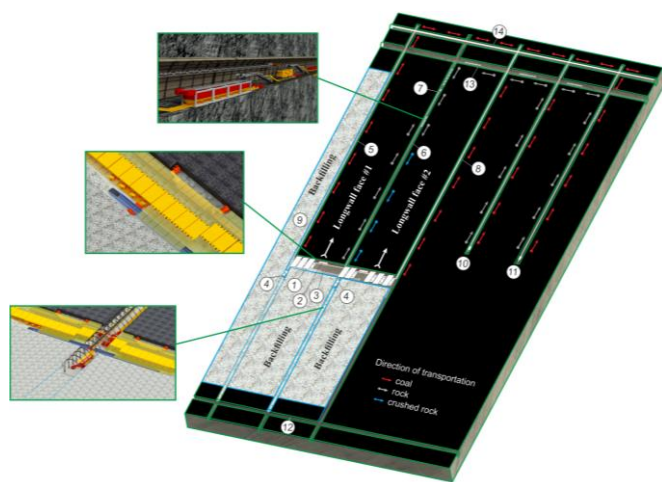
Panel layout of a new selective mining technology with accumulation of mine waste rocks: 1 – mechanized backfilling support; 2 – shearer; 3 – backfilling modular conveyor; 4, 5, 8 – transportation drift; 6 – central accumulation rock drift; 7 – rock crushed equipment; 9 – rock backfilling massif; 10 – drivage of a central accumulating rock drift; 11 – drivage of a transportation drift; 12 – drainage drift; 13 – main haulage drift; 14 – main conveyor drift
